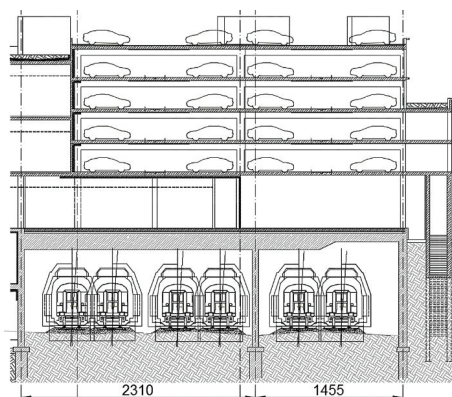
Cross-section of the tunnel covering the railway tracks and the parking deck above
